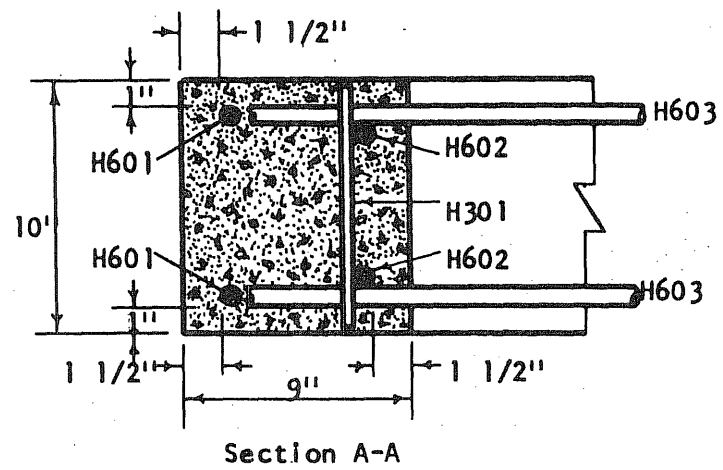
DETAILS OF REINFORCEMENT, SPECIMENS R2 and R3
